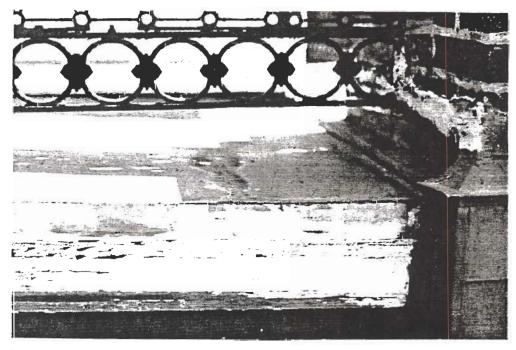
Wood Detail and Flashing Detail at Base of Roof Vent Structure; West Face.
